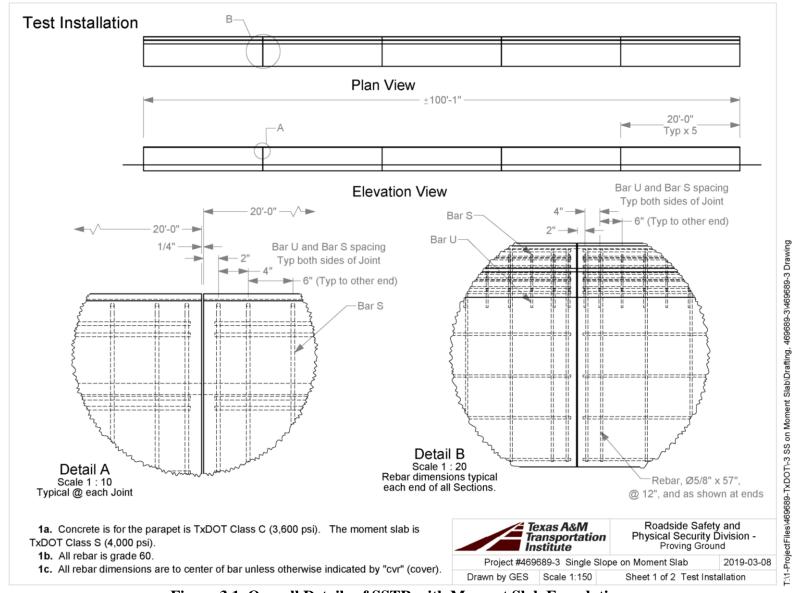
Overall Details of SSTR with Moment Slab Foundation.
